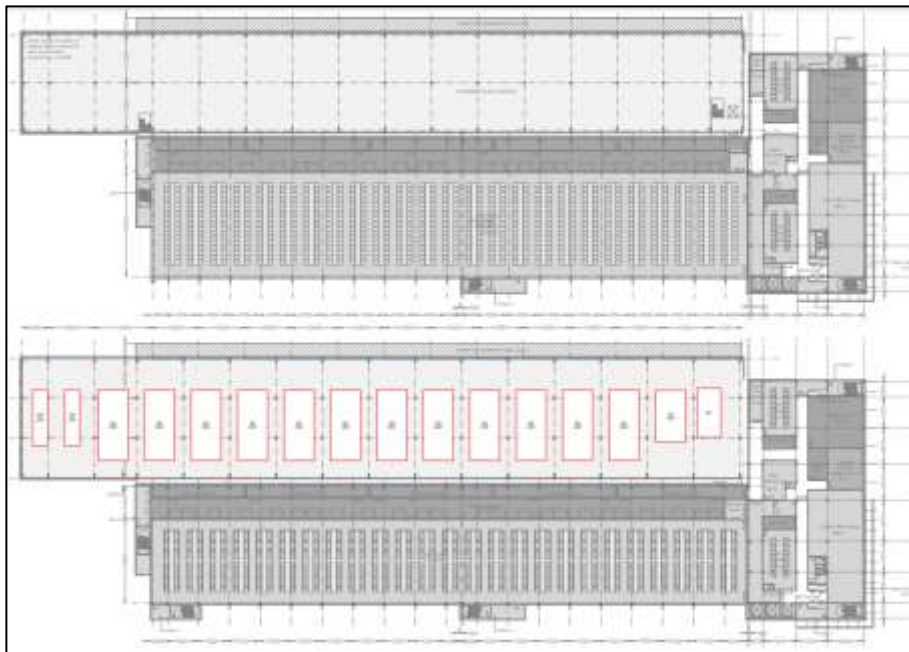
Third Floor Gantry Layout (Chiller Layout) – Buildings A & B
